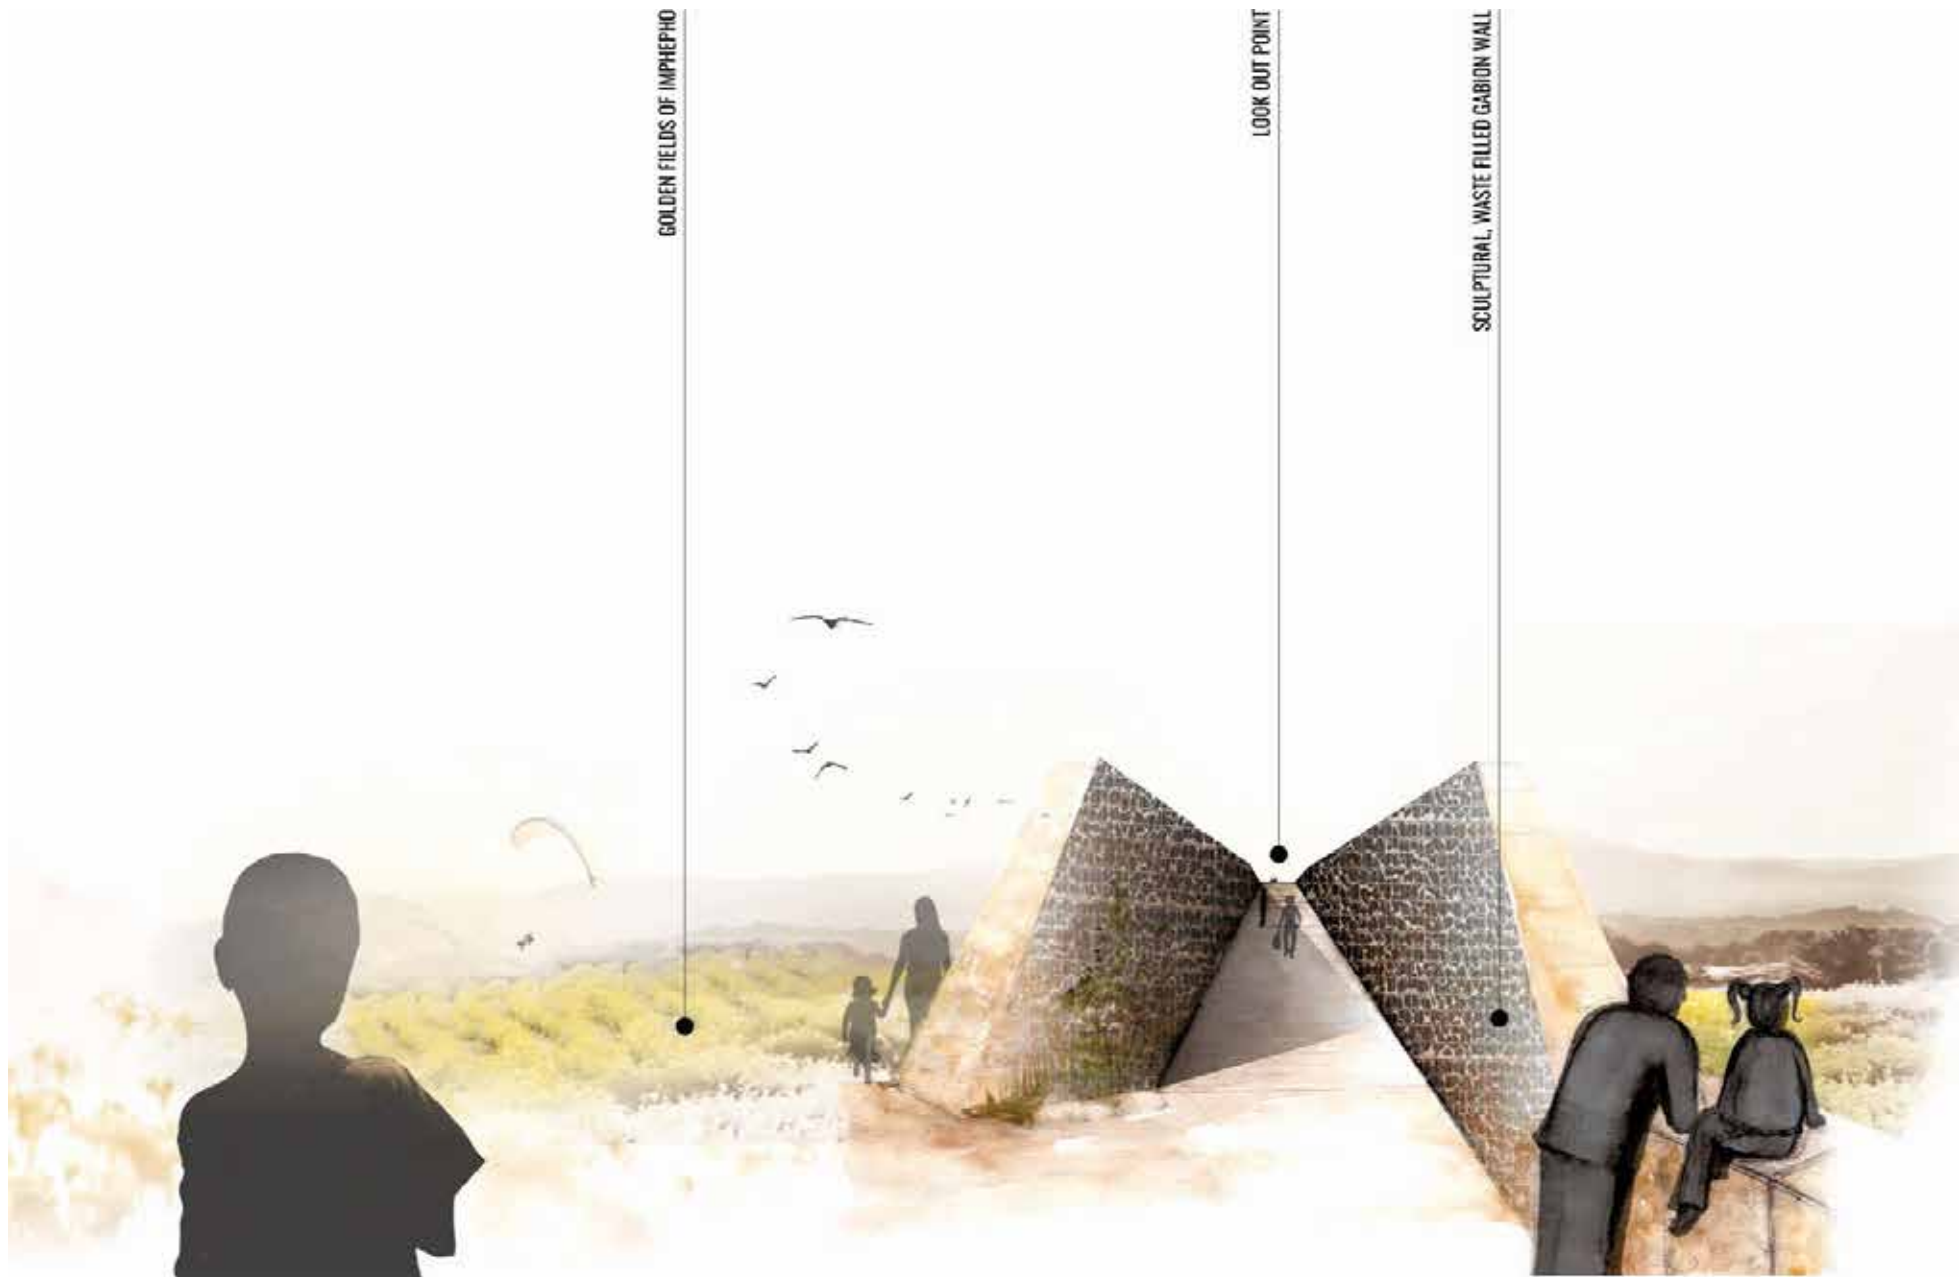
Perspective looking east towards the look out point, with views to Magaliesberg's Panpoort in the distance
